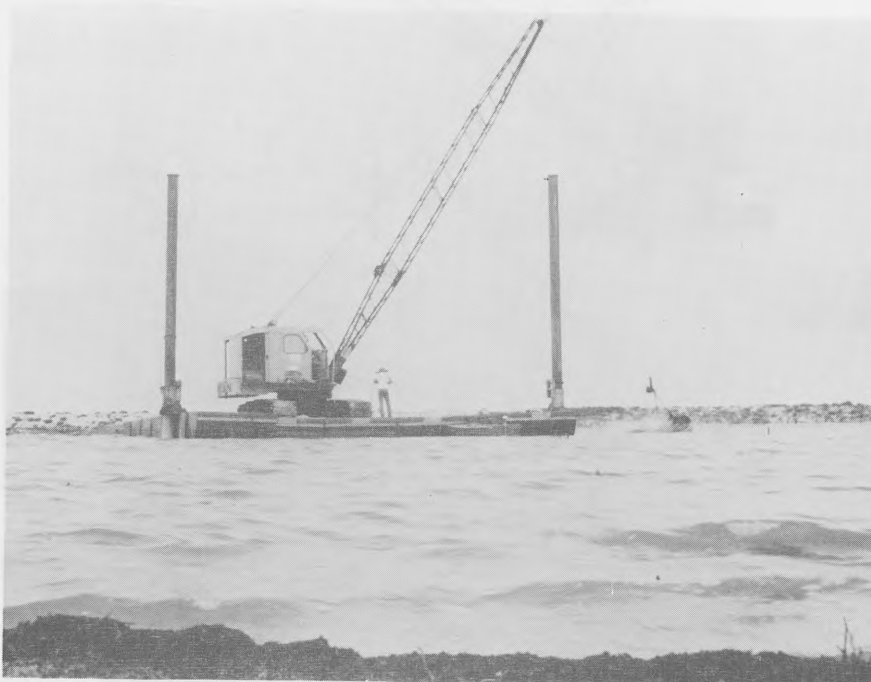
Barge positioning during internal levee construction. With spuds in raised position, bucket casts and retrievals were used to draw the attached barges into new positions as needed.
